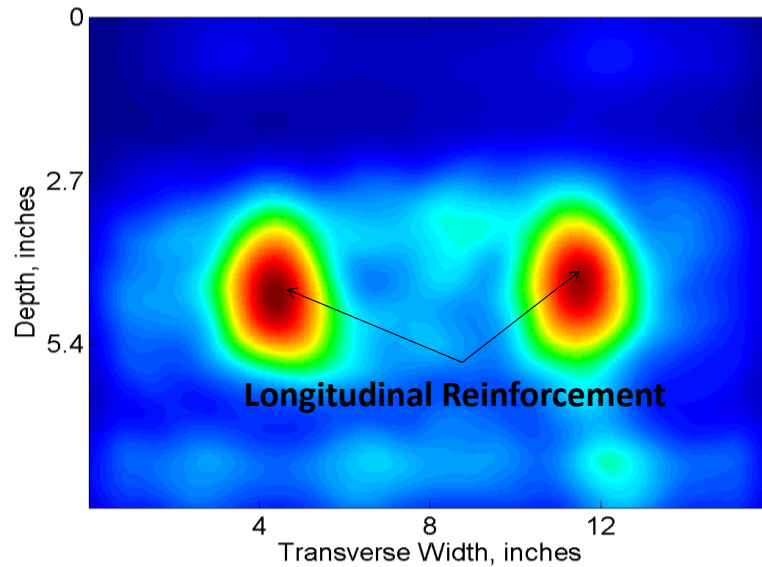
SAFT-IA reconstruction indicating the location of reinforcement and sound concrete condition.
